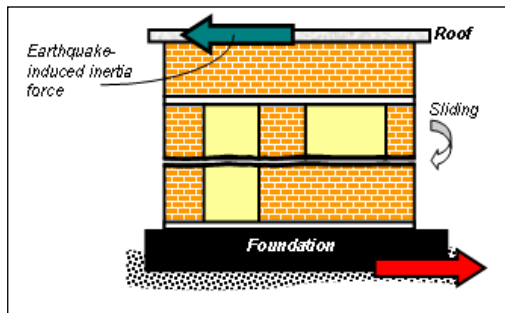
Sliding Failure Mechanism in Masonry Building
